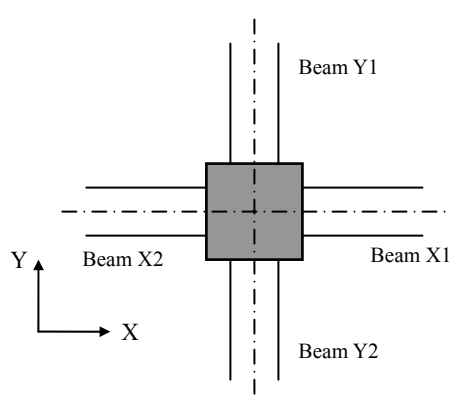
Minimum transverse reinforcements in Column Beam Joint
